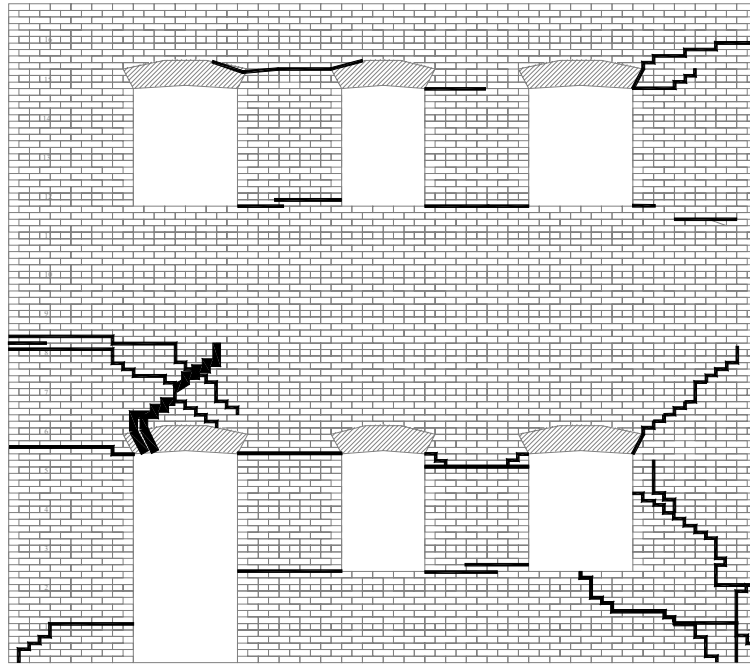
Crack pattern of Wall B following the Group 4 cycles
